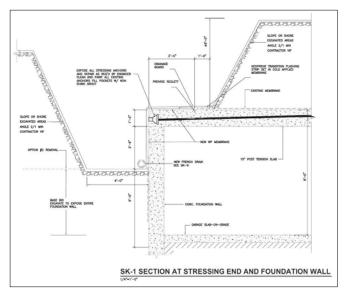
Section detail at stressing end and foundation wall (repair drawing)
